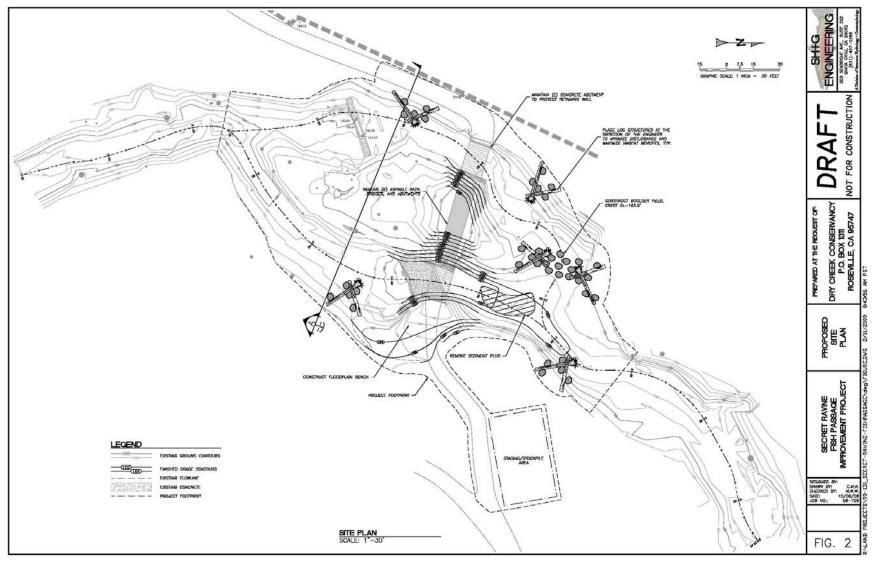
Secret Ravine Fish Passage Improvement Project Site Plan
